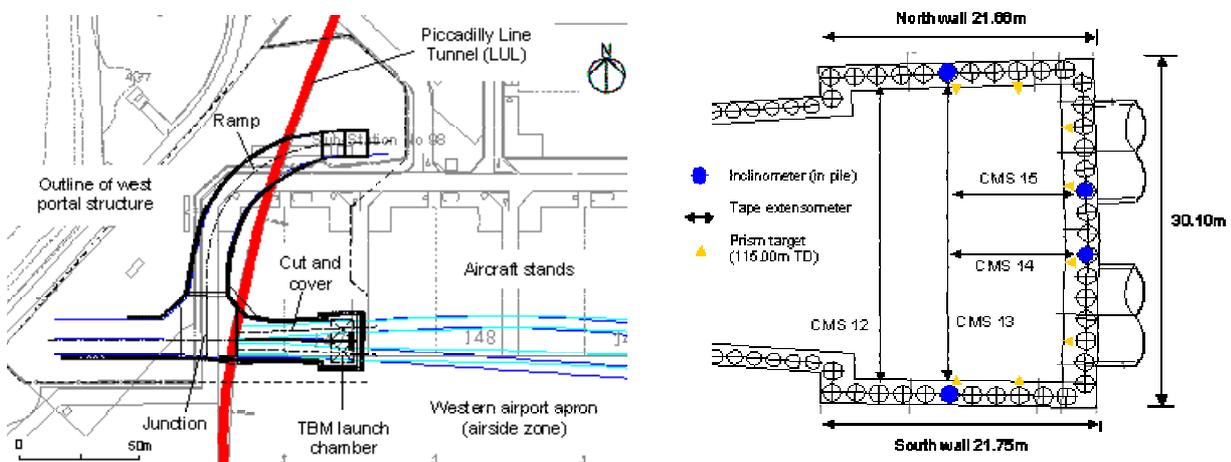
(a) West Portal location plan, (b) TBM launch chamber plan (CMS – convergence measurement section)
